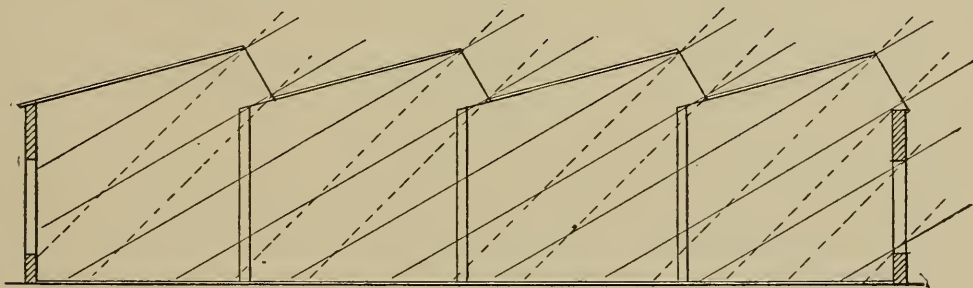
Lighting Diagram. The Saw-tooth Construction of Roof.
